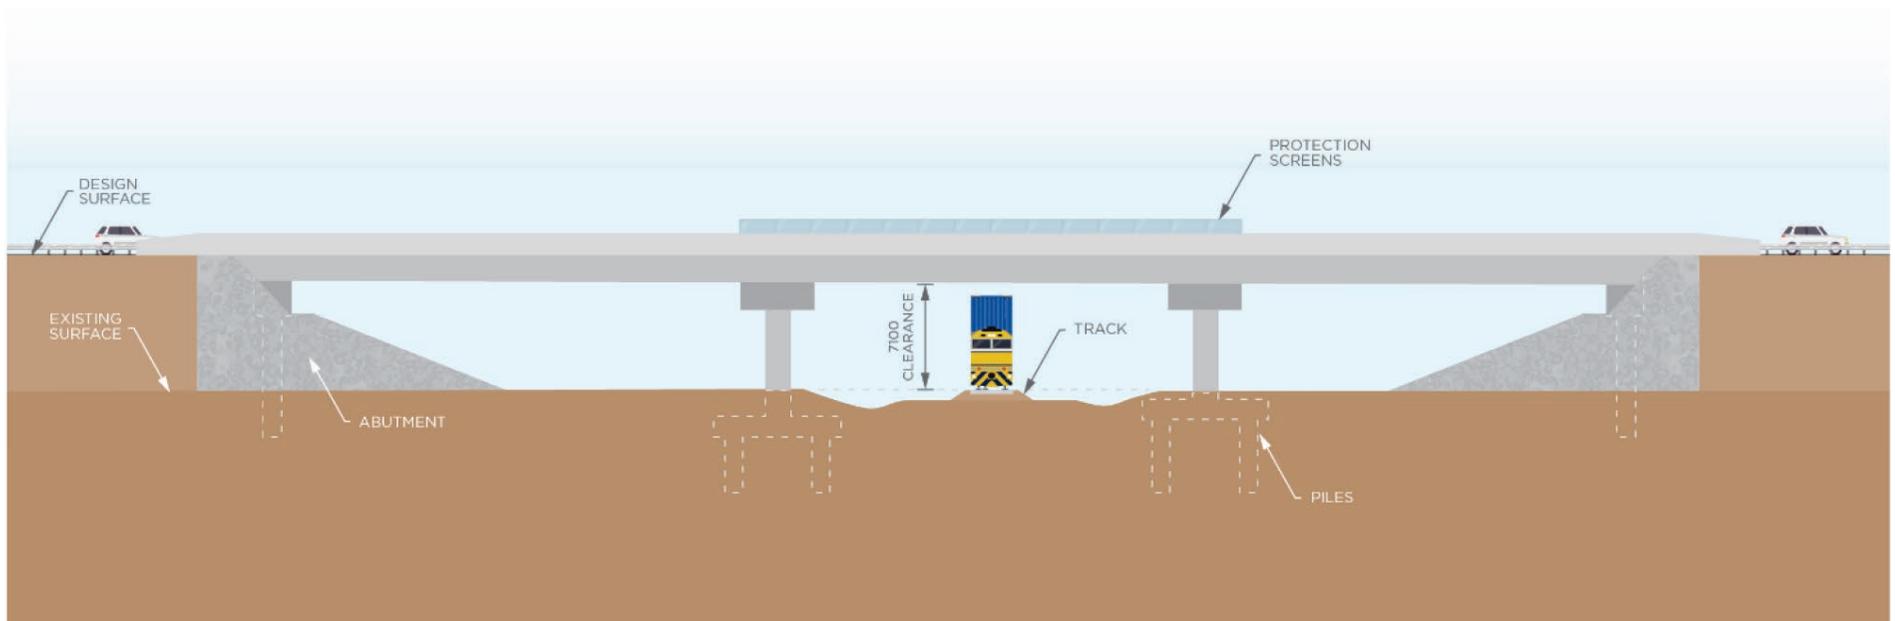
TYPICAL SECTION OF ROAD OVER RAIL BRIDGE STRUCTURE
